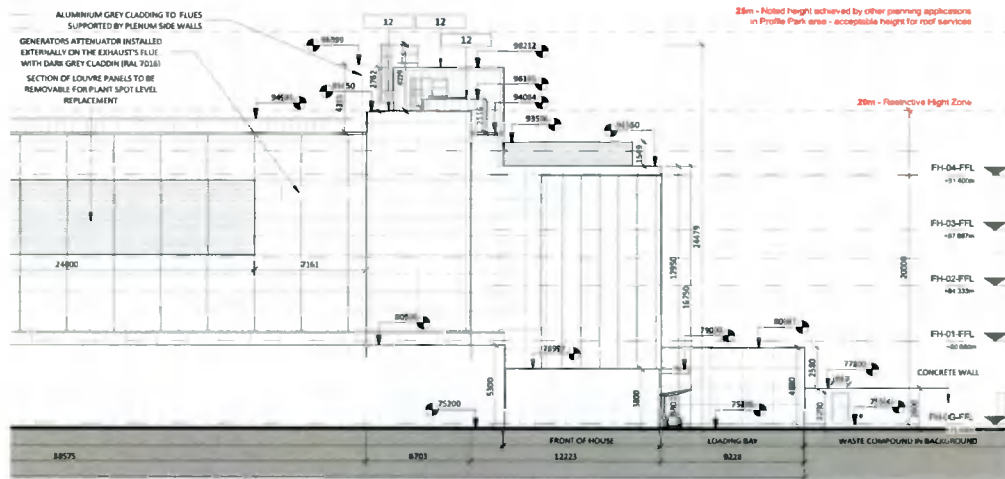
Partial View of the Proposed North Elevation (Facing Nangor Road)
